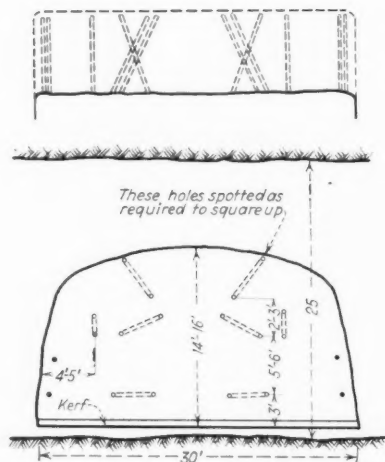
Drilling plan for 30-ft.-wide room, carbon-dioxide shooting, Streeter mine.
